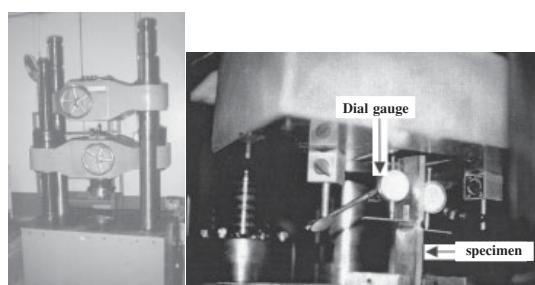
Universal Testing Machine and test set-up for type 1 welded connections specimen.
